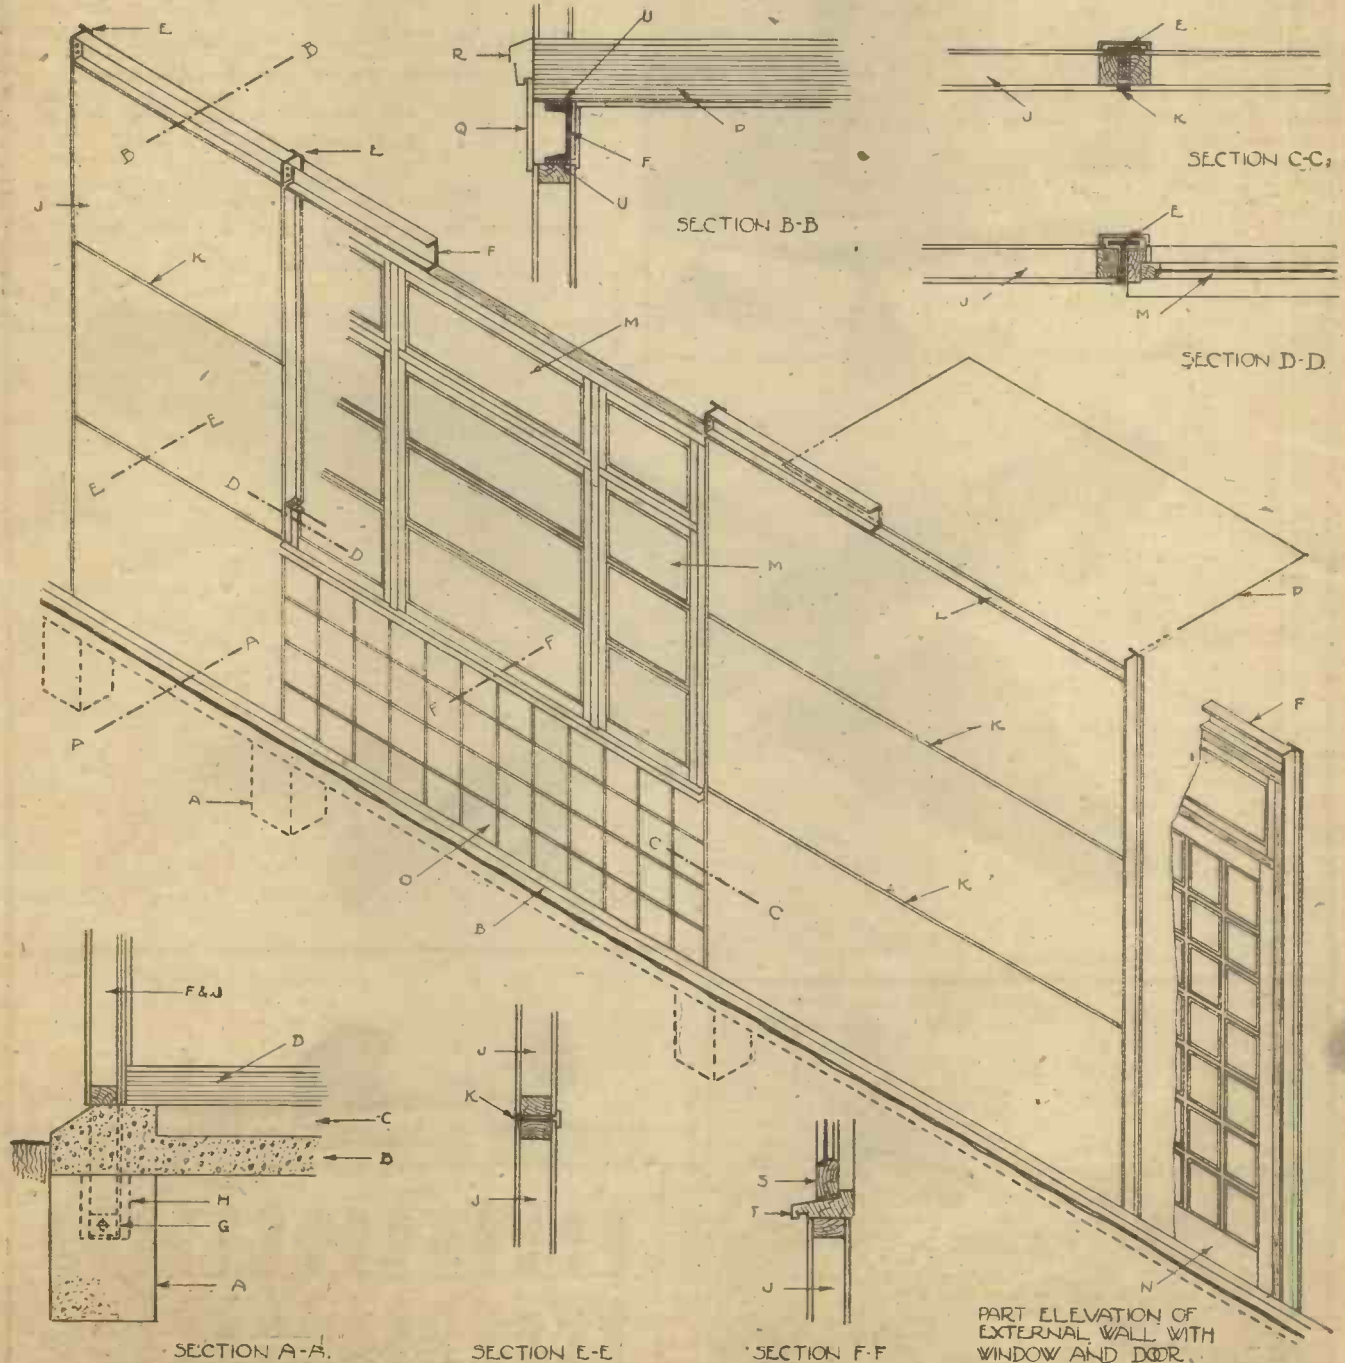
External wall constructed with steel skeleton framework and pre-built wall units set with their length horizontally; general details and sections A-A to F-F.
